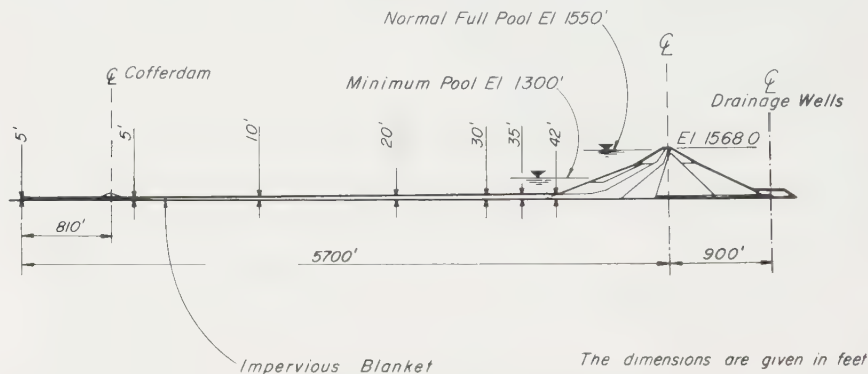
Tarbela Dam, West Pakistan. Cross section of main embankment and blanket
